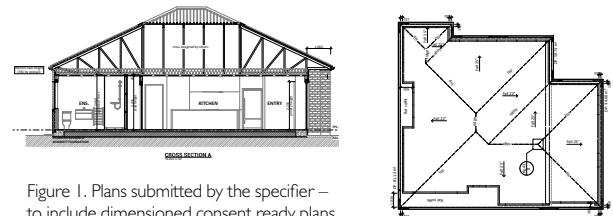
Plans submitted by the specifier – to include dimensioned consent ready plans
